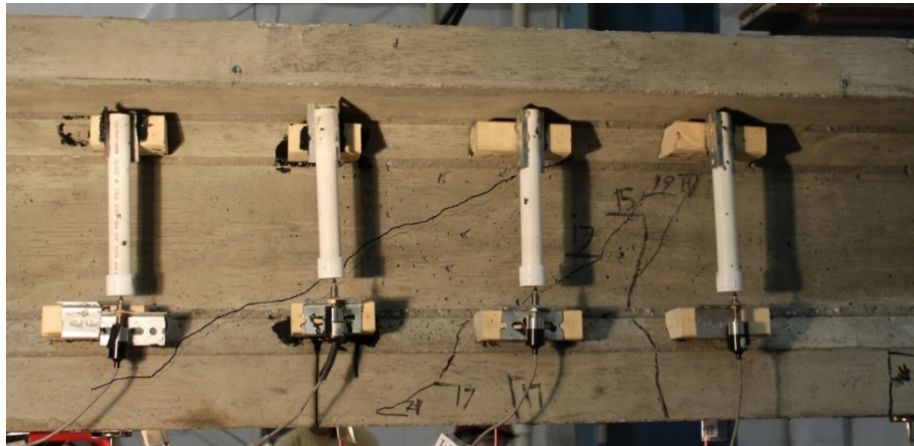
Crack Propagation through LVDTs for Specimen 5 with Minimum NEFMAC Reinforcement
